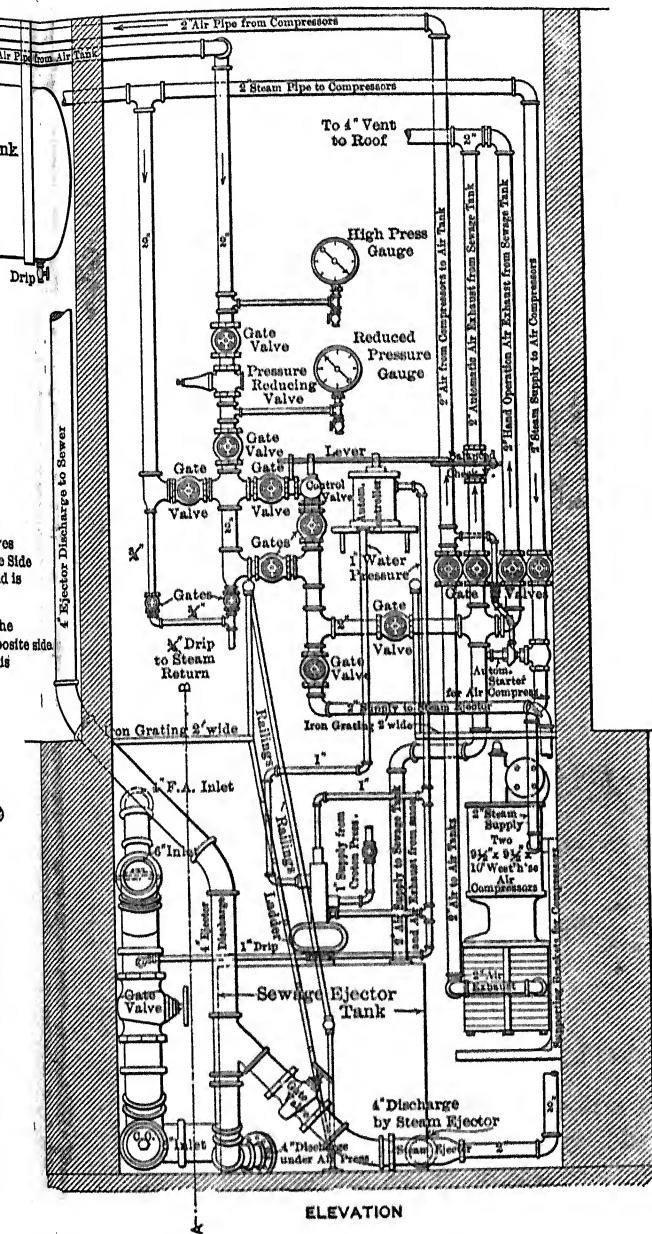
Elevation of Sewage Lifts Shown in Plan in Fig. 22.
